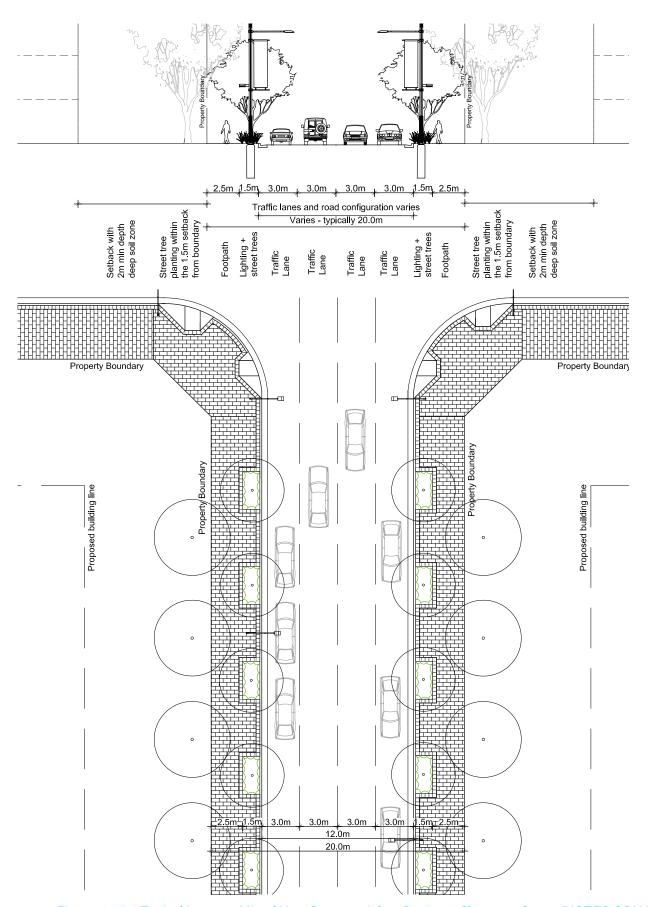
Typical Layout - Mixed Use, Commercial, or Business Character Street (NOT TO SCALE) Secondary Road - Typically 20 metres wide
